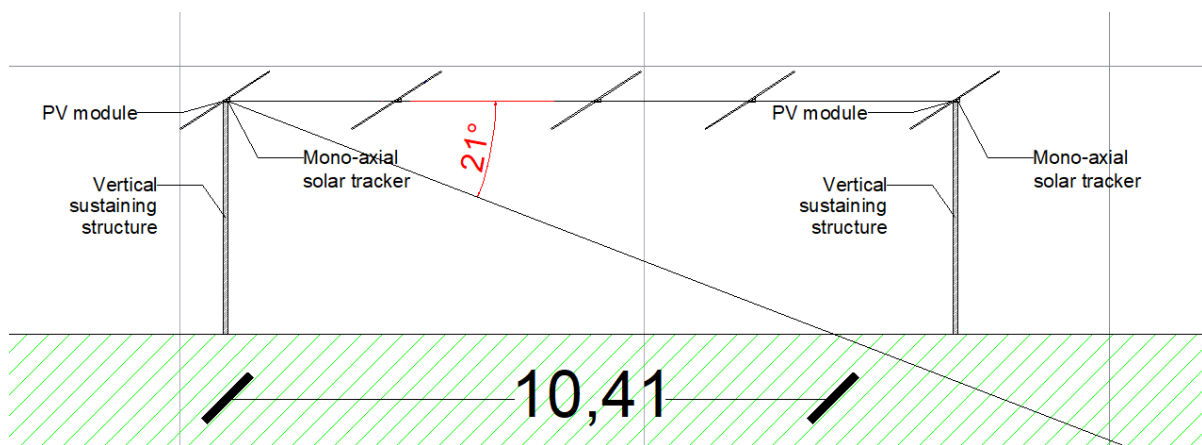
Rendering of the Stilt mounted bifacial PV modules' structures – Elevated configuration's view.
